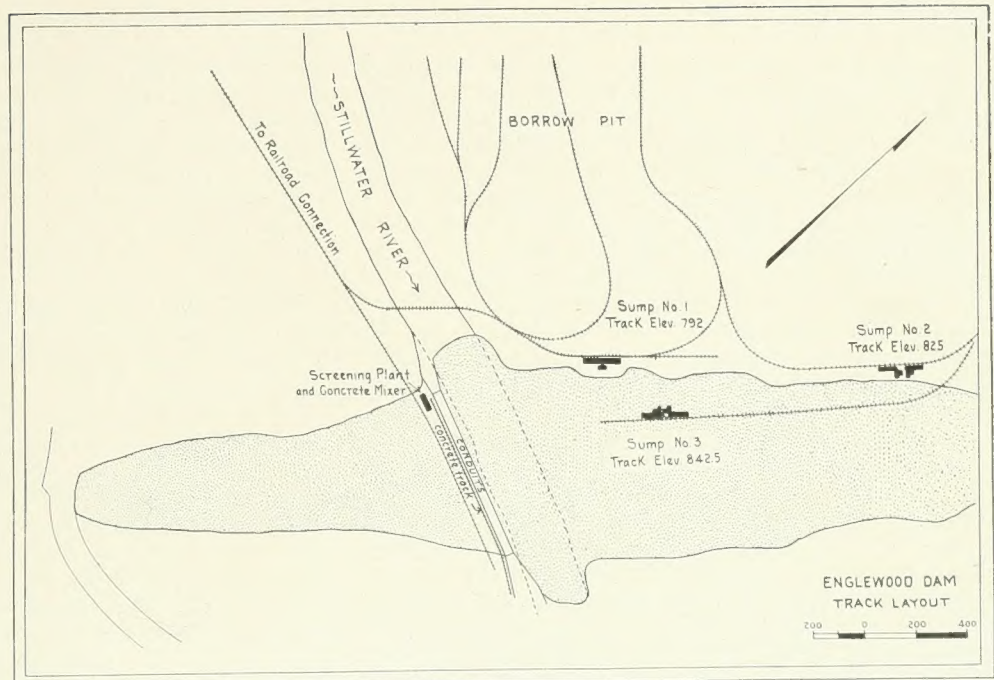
TRACK LAYOUT, ENGLEWOOD DAM.
